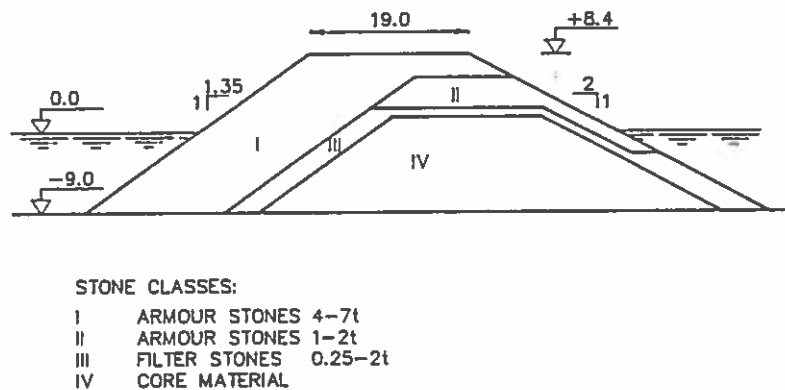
Typical cross-section for a berm breakwater at Hay Point. (Based on figure from Bremner et al (1987)). All measures are in metres.
